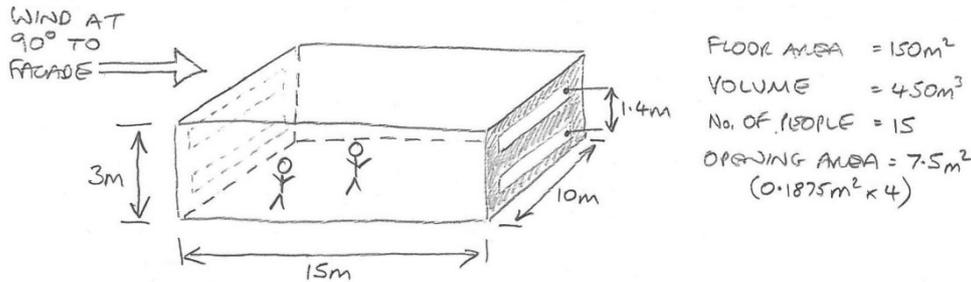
Example building zone with cross ventilation and 5% ventilation openings
